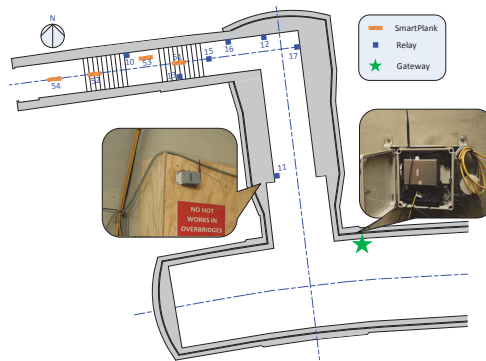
Wireless sensor network deployment at TCR Stair 14 (plan view)
